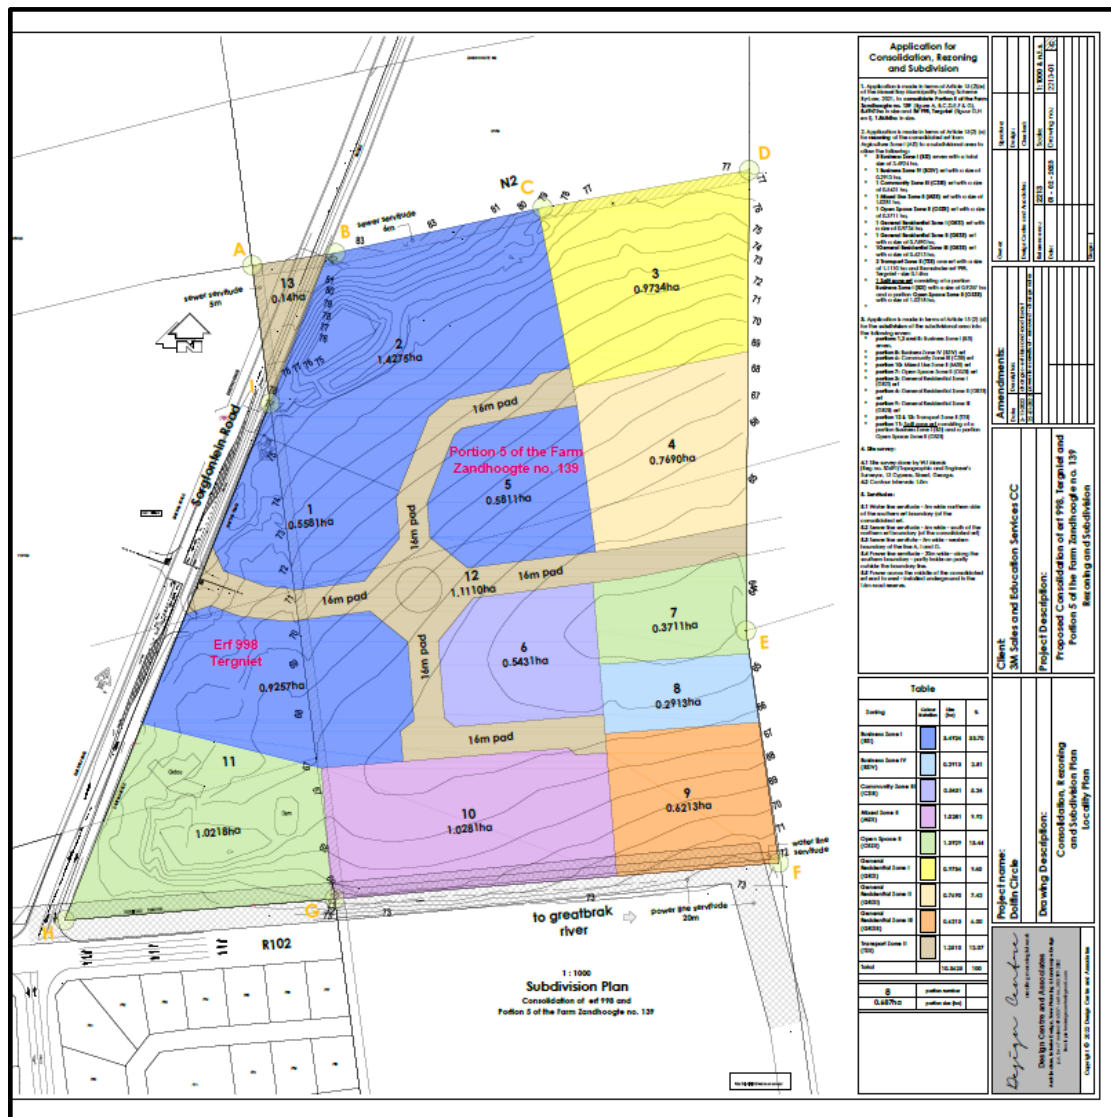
Proposed site development plan (SDP), alternative C, for Erf 998, Tergniet and the Farm Zandhoogte no. 139.
